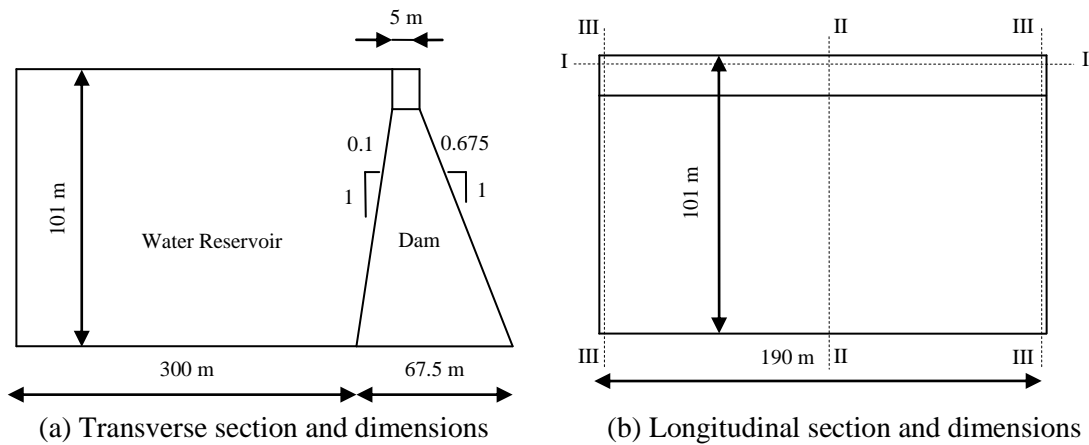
Sections and dimensions of the Oued Fodda concrete gravity dam
